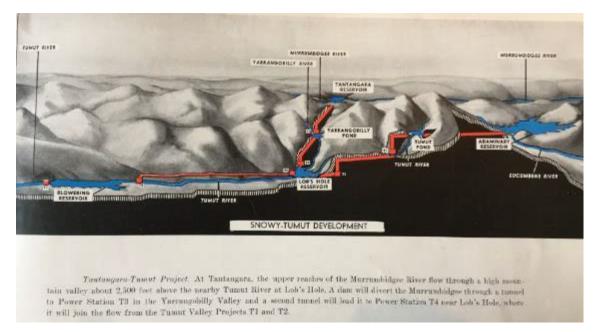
The current project in its original plan. Source: David Rosetta, Glough.
